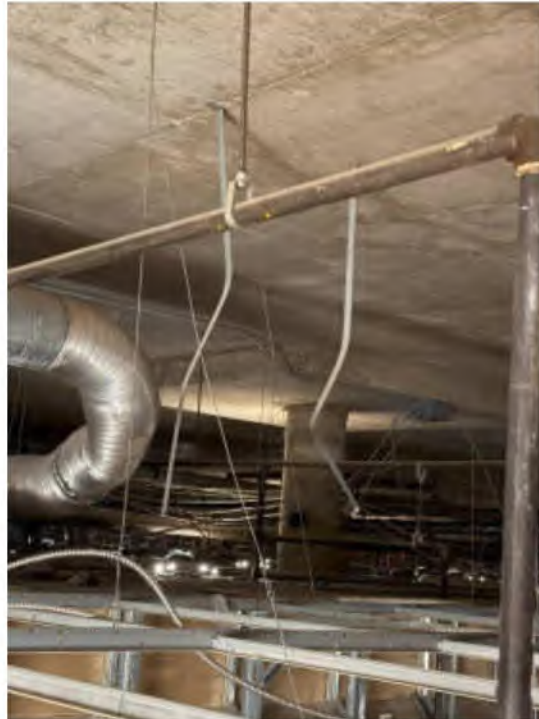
Underside Roof Slab Concrete Column and Drop Panel General Condition
